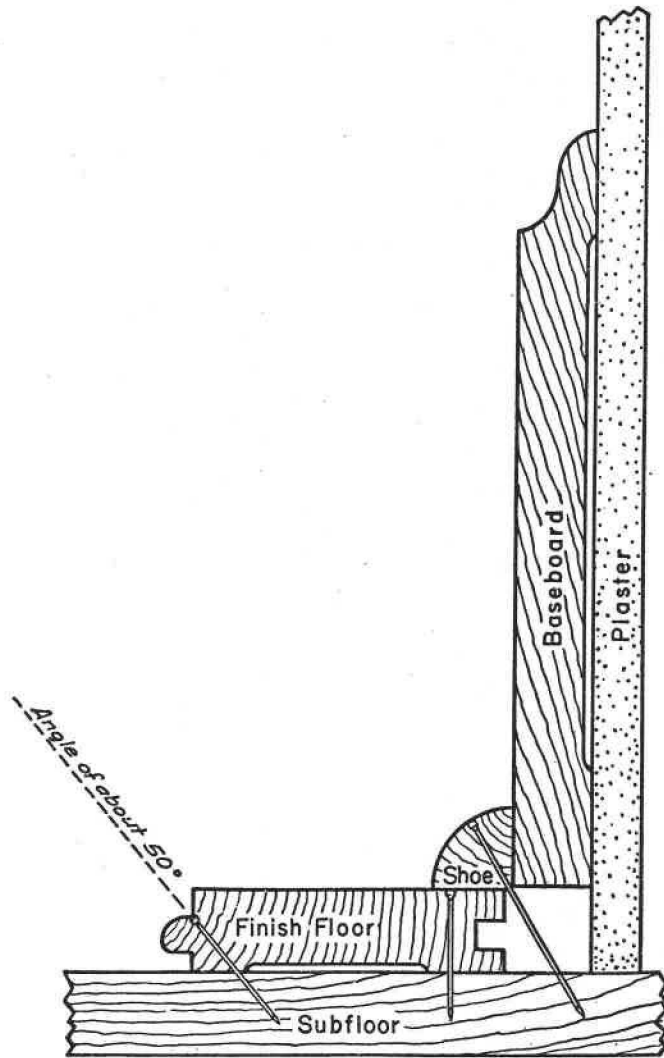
Laying the first strip of finish flooring. The finish molding is usually not put down until all the flooring strips have been laid. It is shown in place here merely to indicate its position in reference to the first strip of flooring.
